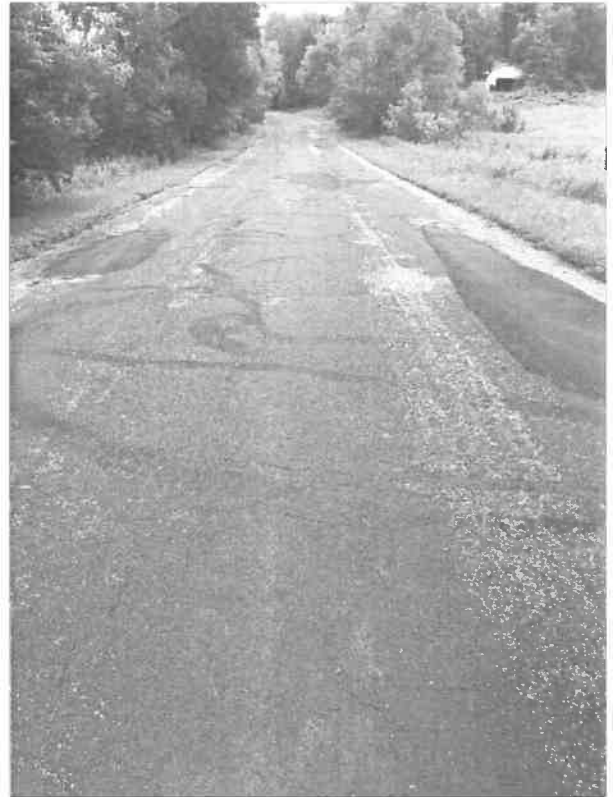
101st St N – showing alligator cracking, edge patching & deteriorating pavement
